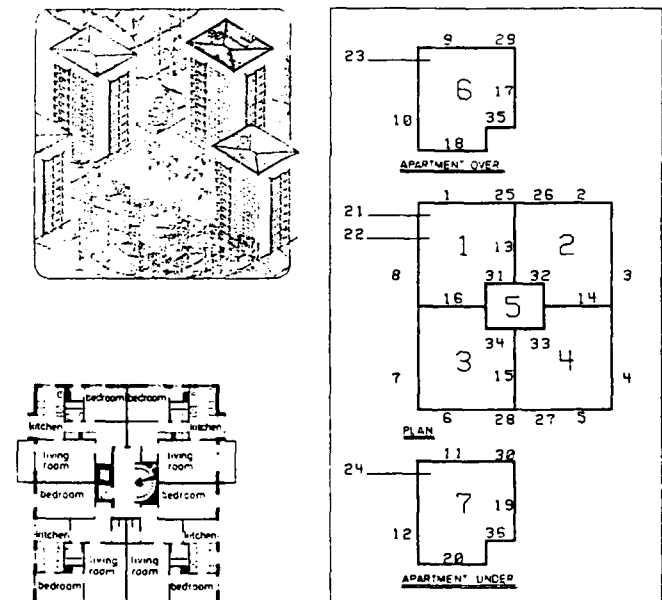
Perspective view of a multistorey concrete frame residential building (Broberg, 1987), with an original plan and a simplified one used in PROMIX. Figures denote confinements, walls, floors and venting openings.
